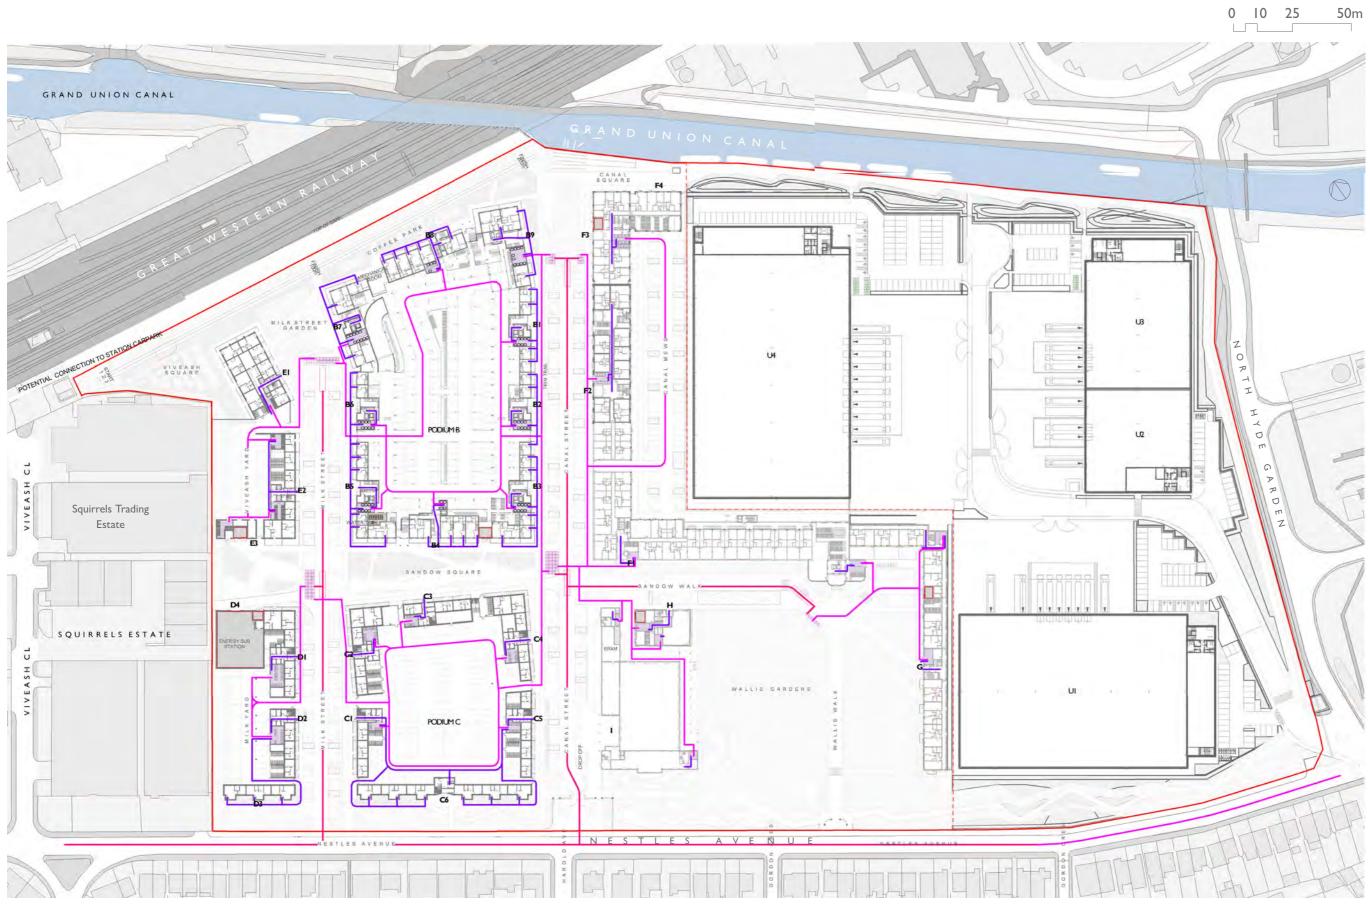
Servicing Strategy - Masterplan layout showing the distribution of the bins storages
